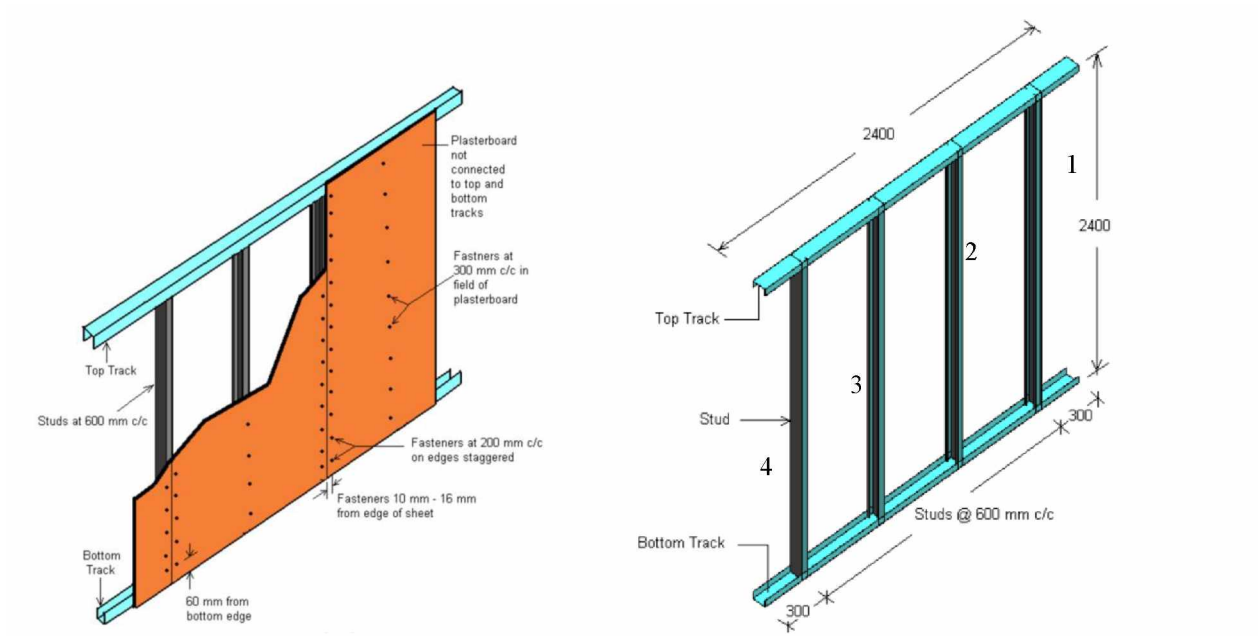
Gypsum board wall assembly (left) and steel studs (right) [1]
